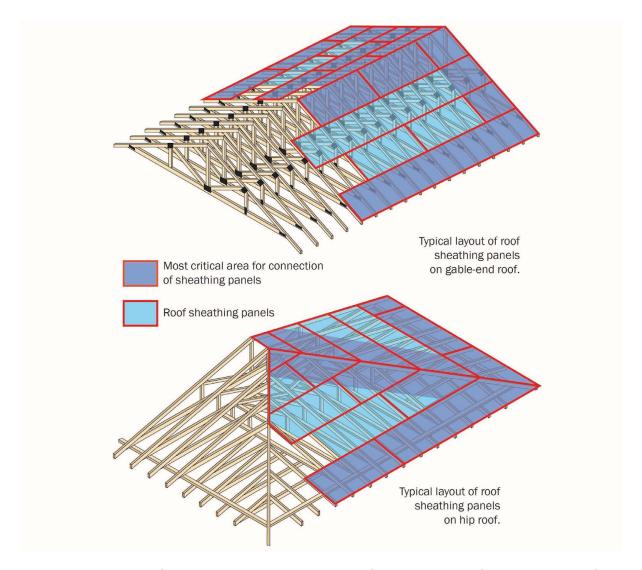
Examples of proper sheathing panel layouts for gable-end roof (top) and hip roofs (bottom)
